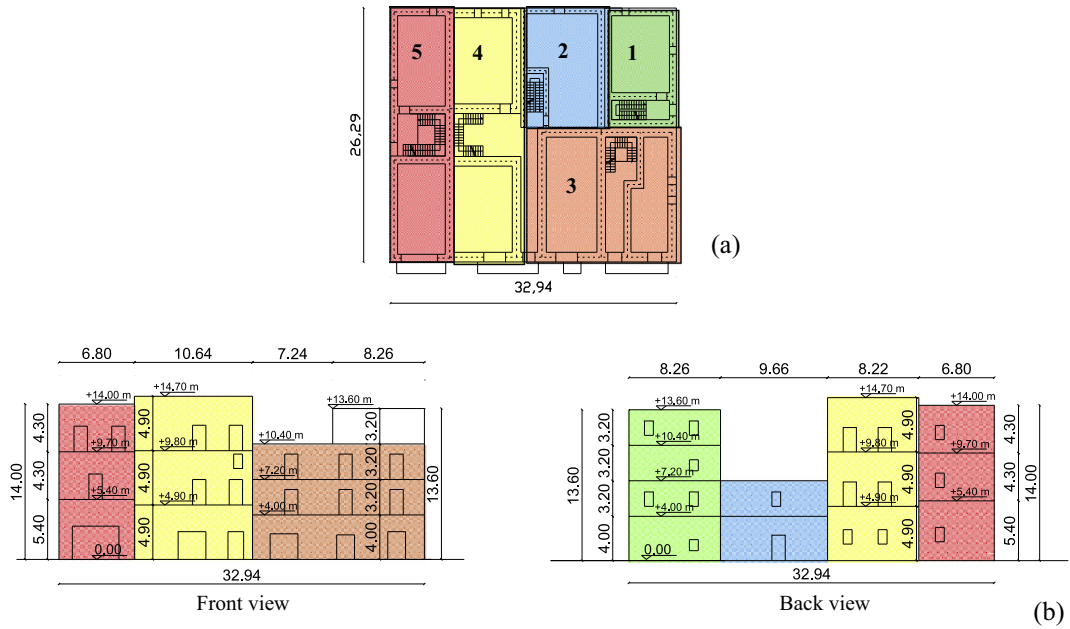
Subdivision in structural units (a) and external views (b) of the masonry compound in Torre del Greco.
